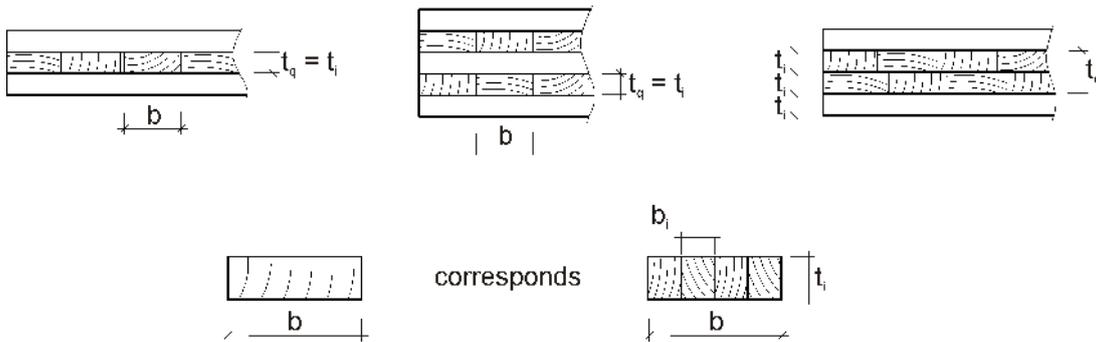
Typical dimensions of cross section of KLH-CLT lamellas
